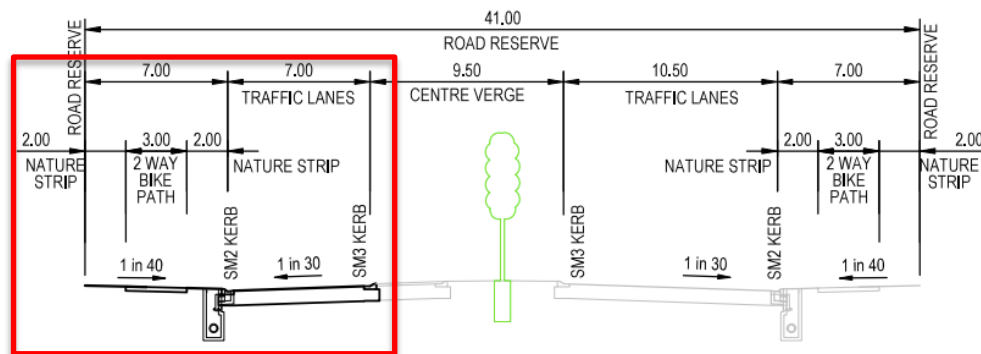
VPA Benchmark Costings - Arterial Road Cross Section
